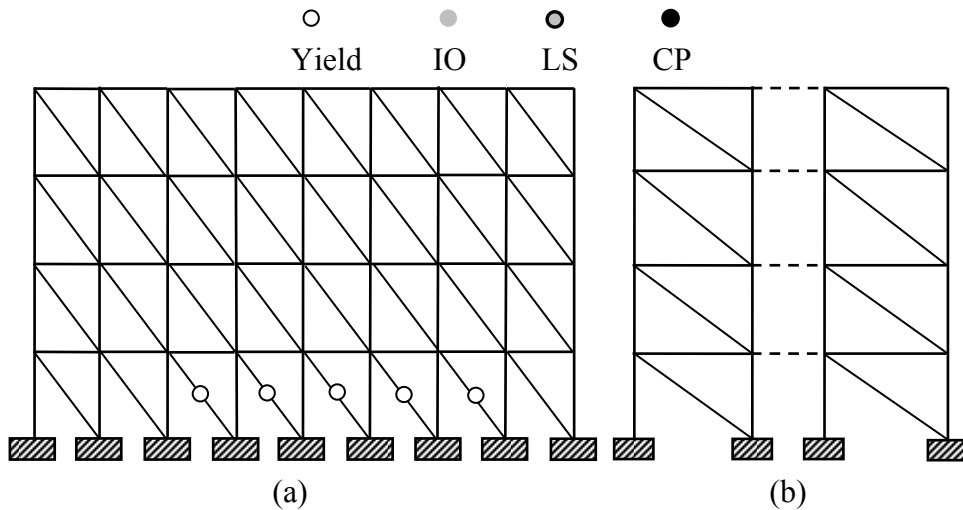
Hinge pattern under gravity load for the four storey uniformly infilled frame building, designed for gravity loads only, when construction sequence is not considered in analysis: (a) typical longitudinal frame; (b) typical transverse frame.
